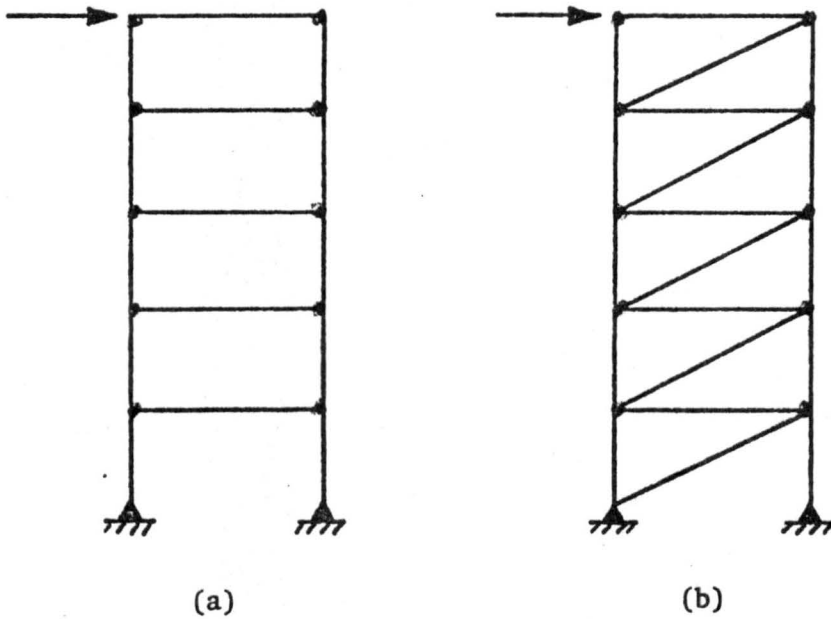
An unstable (a) and a stable (b) vertical truss.
